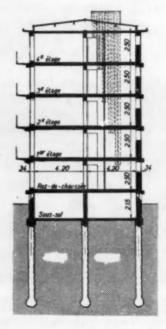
Section through 5-story Building with Load-bearing Walls.
